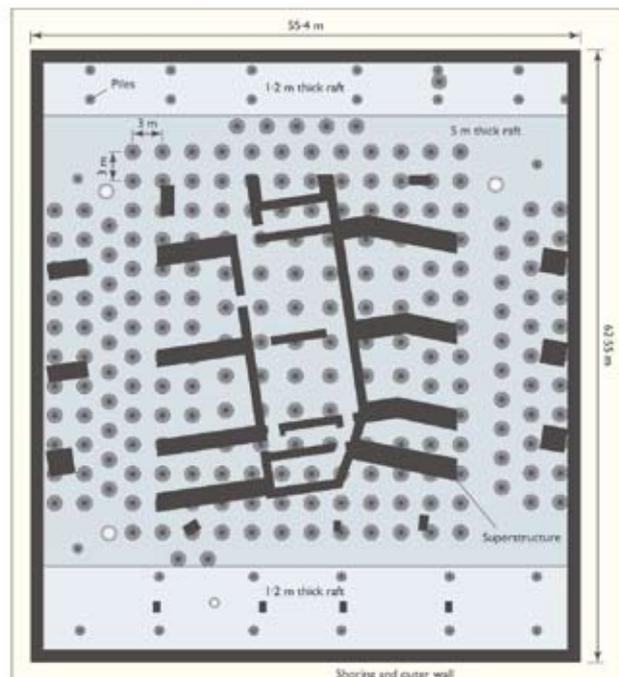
Layout of the 1.2-1.5 m diameter 32-42 m deep piles under the foundation raft (see Table 6 for pile details)
